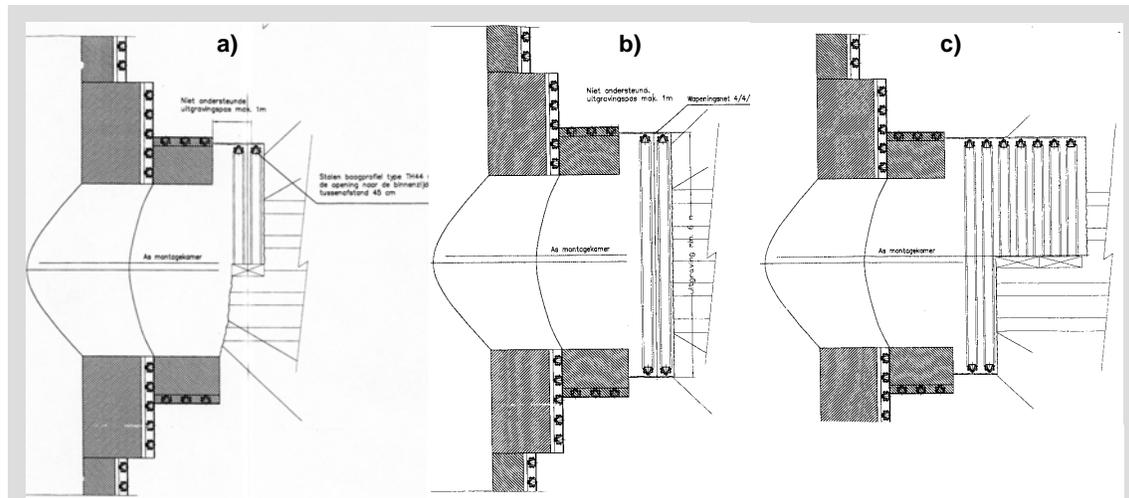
Excavation of the mounting chamber. a) Excavation of the top half over a distance of 1 metre and installation of the top half of the first two sliding ribs; b) Excavation of the bottom half over a distance of 1 metre and closing of the first two sliding ribs; c) Excavation of the complete top half and installation of the sliding ribs. (The excavation of the complete bottom half is not depicted.)
